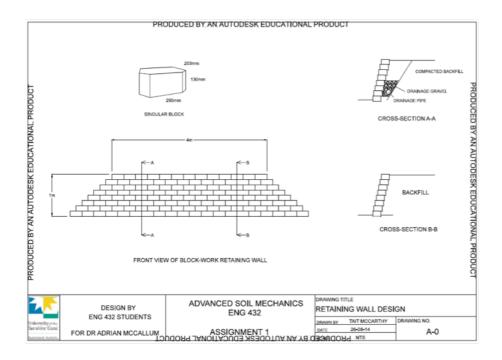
Basic retaining wall design incorporating block detail, retained soil and drainage.
